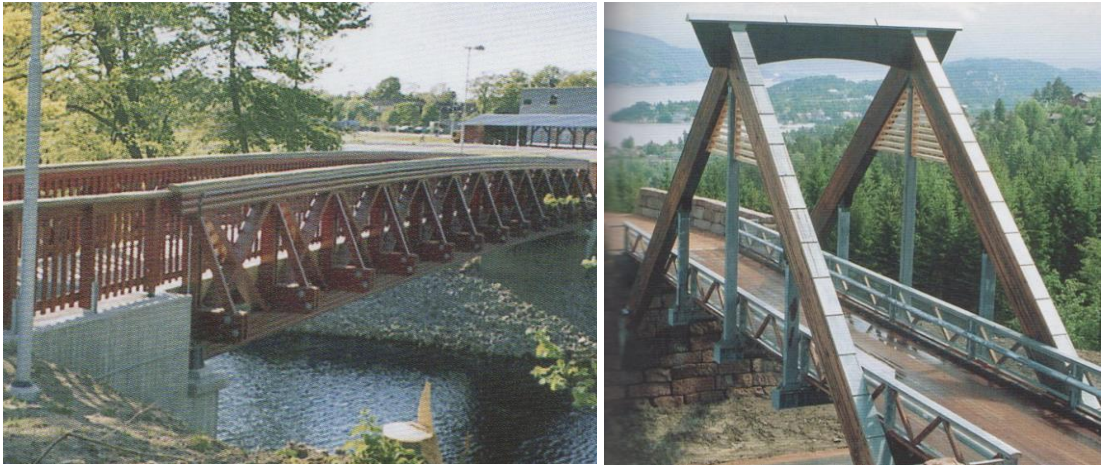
The two Howe and king post truss timber bridges (Nordic Industrial Fund 2002).
